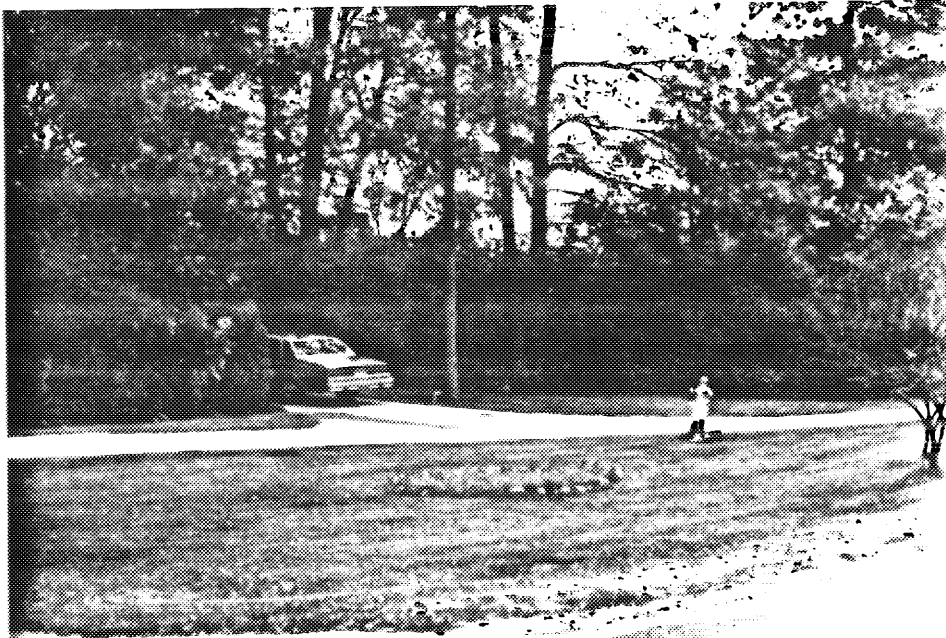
Downstream face and right abutment of dam on west side of Waubeeka Lake. First floor of home in impact area is defined by the deck, left.
